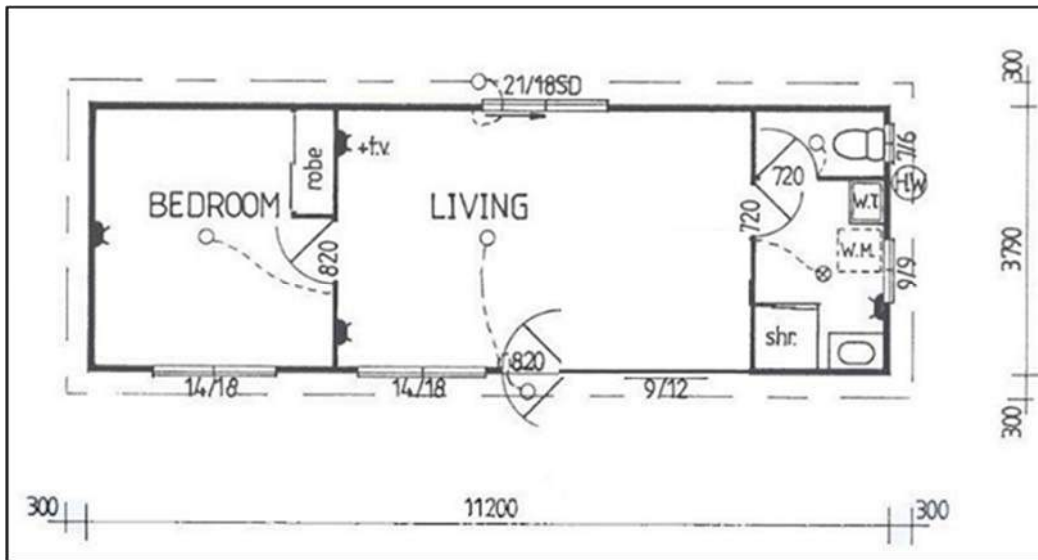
Typical Flor plan of Staff Accommodation demountable
